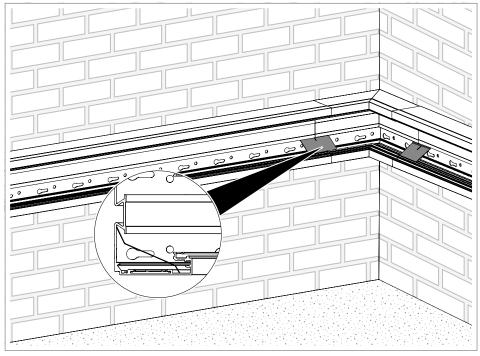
Mounting the internal corner/external corner – earthing coupling
